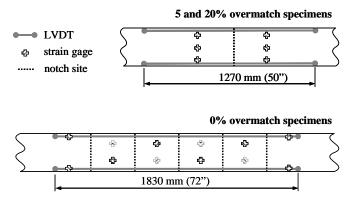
Sketch of specimen showing placement of LVDTs and strain gages.
